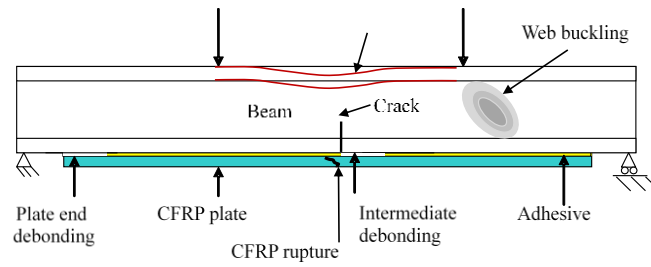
Typical failure modes of CFRP-strengthened steel beams (Teng *et al.* 2012).
